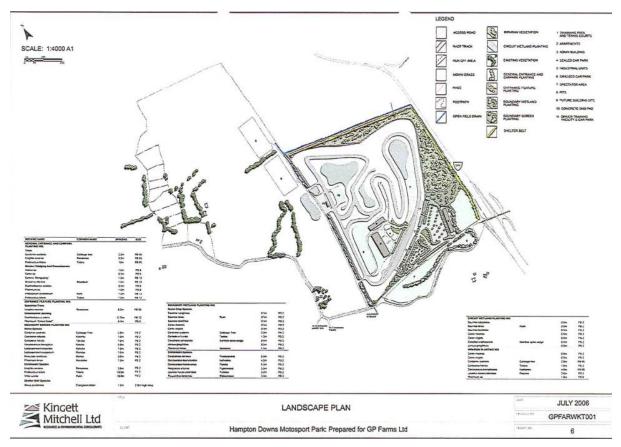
Appendix 12, Attachment D, Landscape Plan
